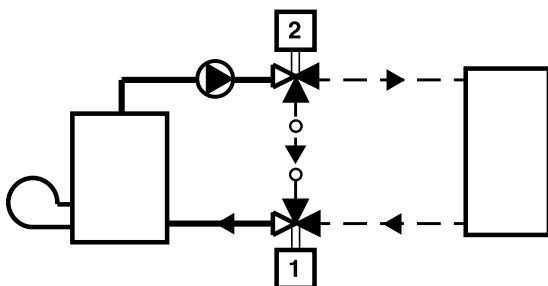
Mounting 3-port valve for mixing (1) or diverting (2)
